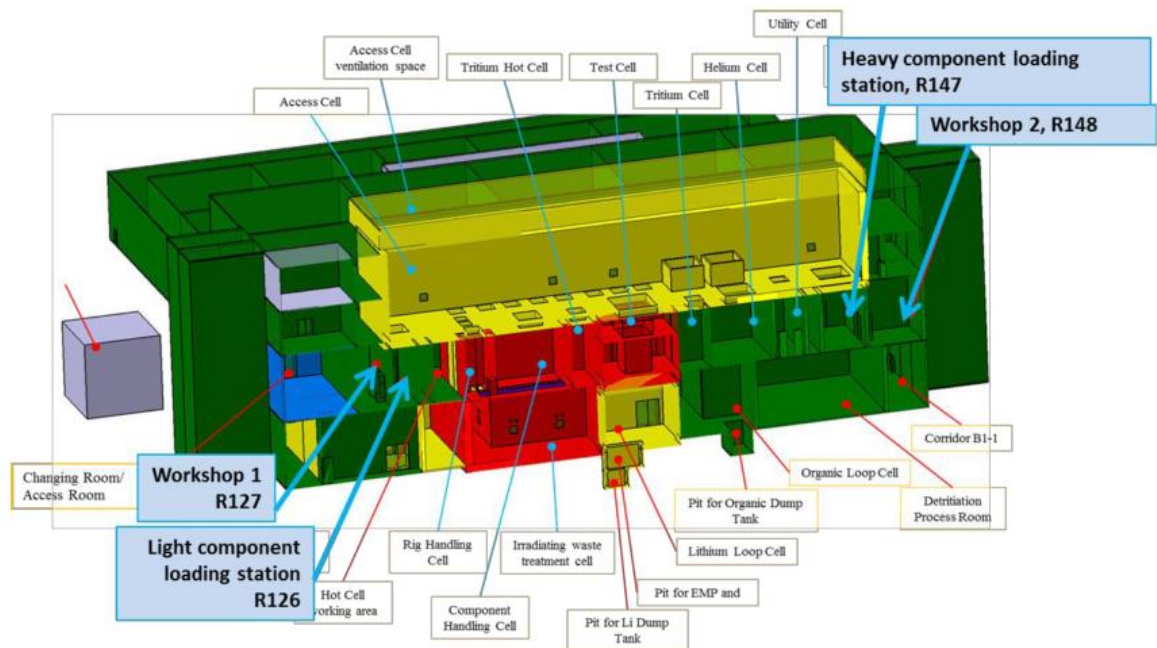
Isometric view of the current layout of Test Facilities, showing both loading stations and workshops[4]
